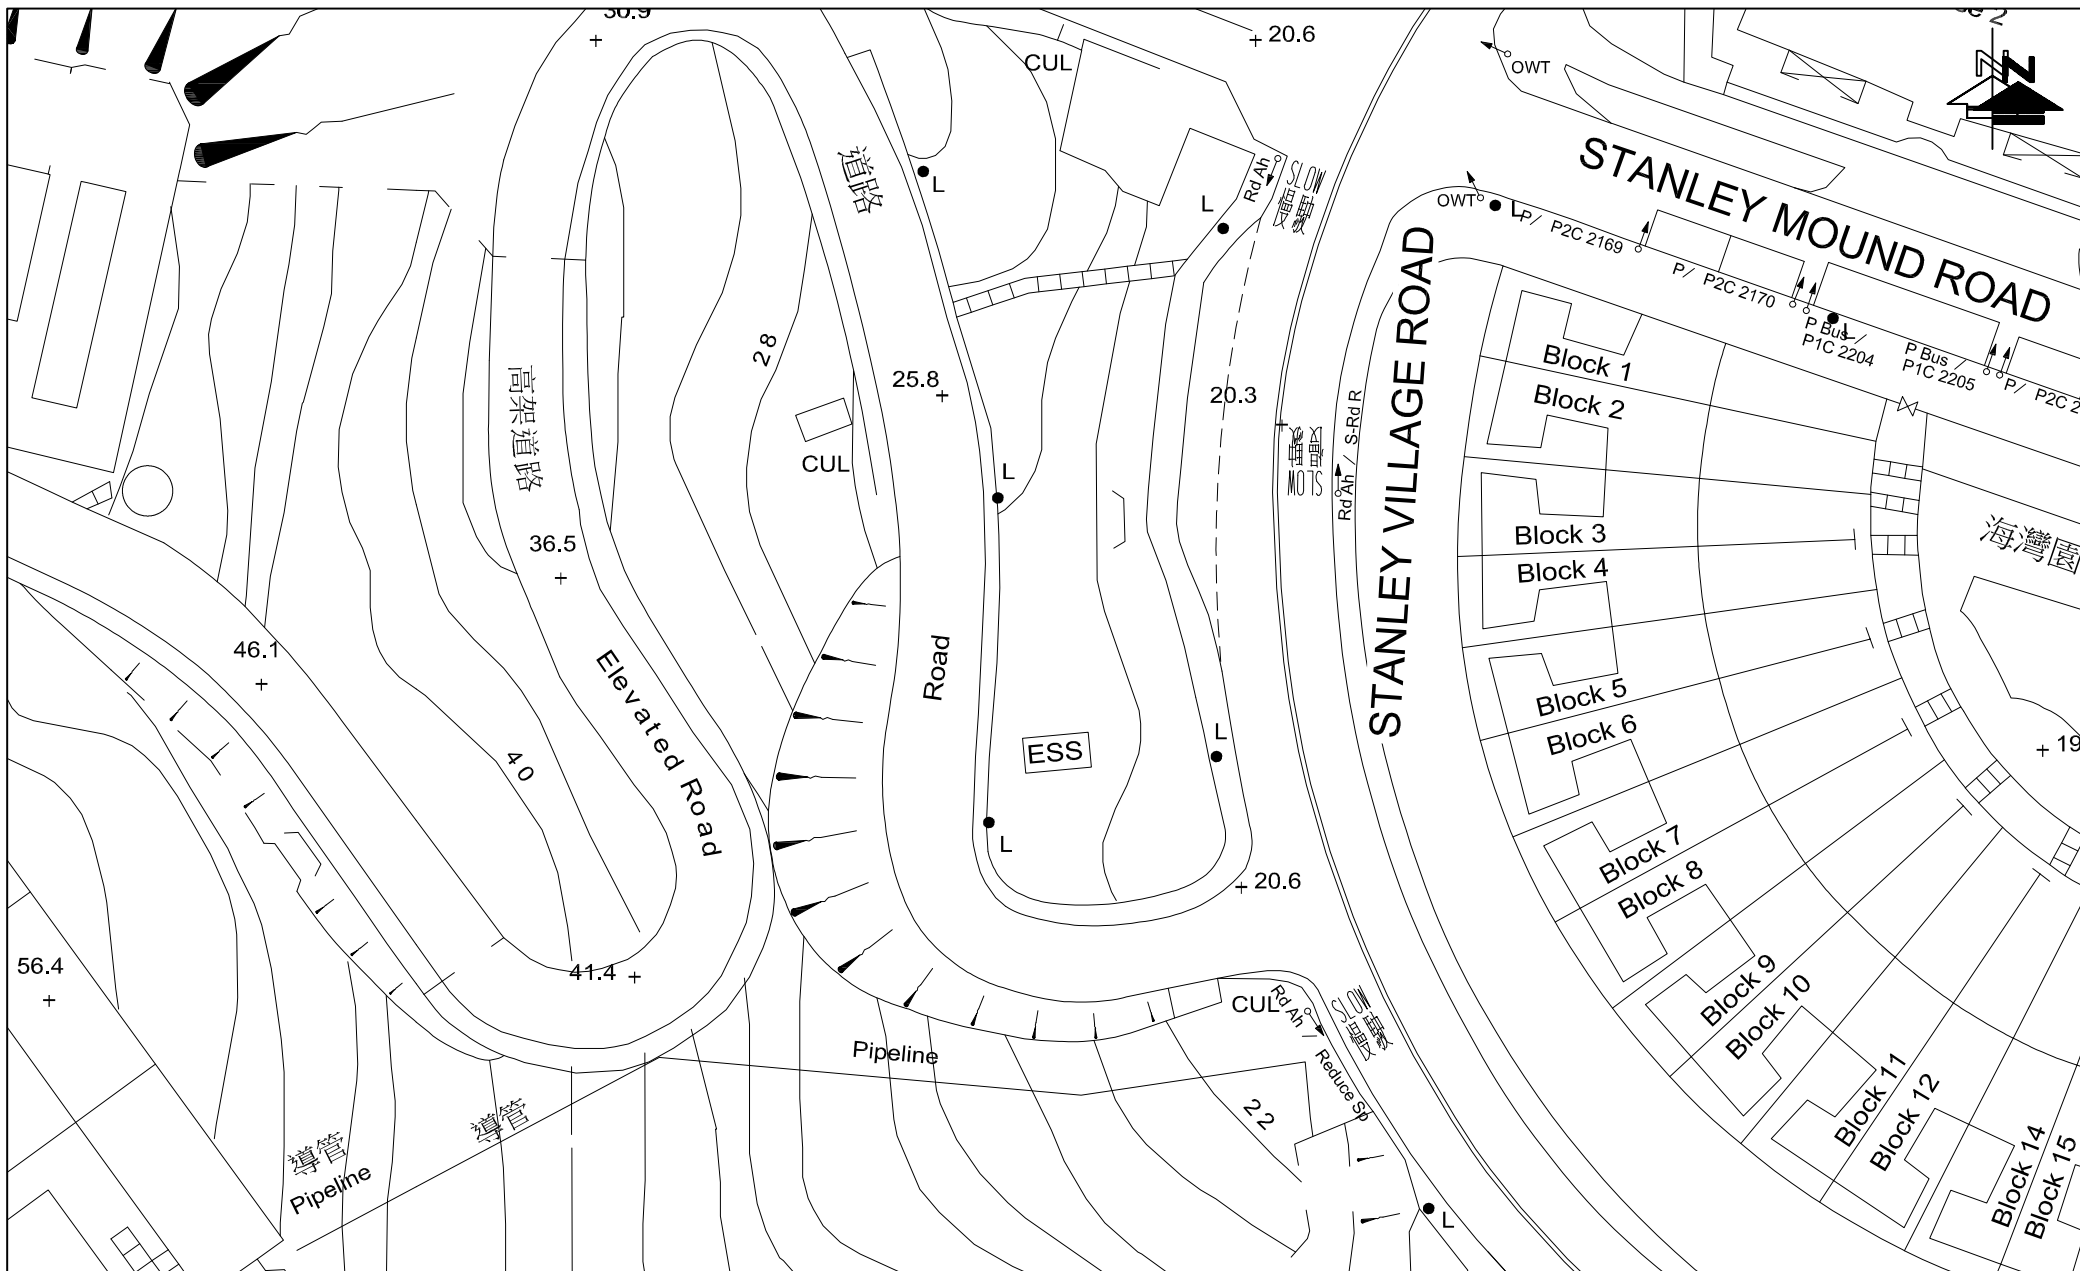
PROJECT TITLE:		Section 16 Planning Application for Minor Relaxation of Plot Ratio, Building Height & Site Coverage Restrictions for Proposed Residential Development at 44 Stanley Village Road, Hong Kong
